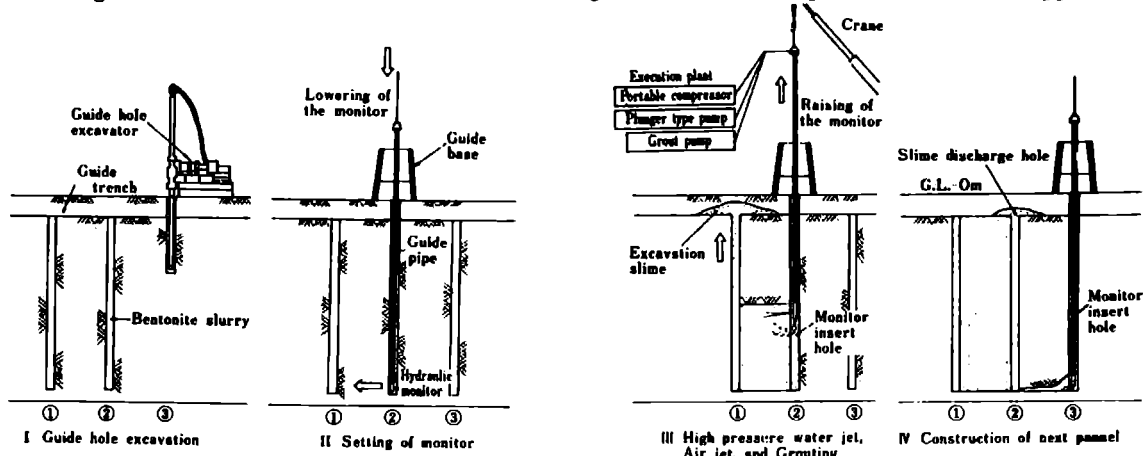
Construction Order of Underground Cut-off wall by Induction Grouting Method Utilizing High Speed Water jet.
